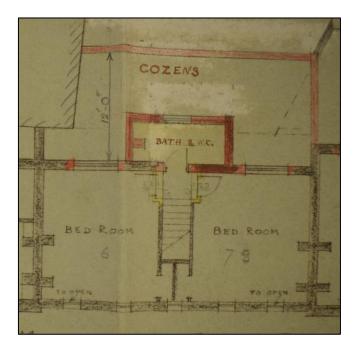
Proposed 1932 1st floor alterations to No. 2 Magdalene Lane (SWHT Ref. D/B/ta/24/1/79/1648)
